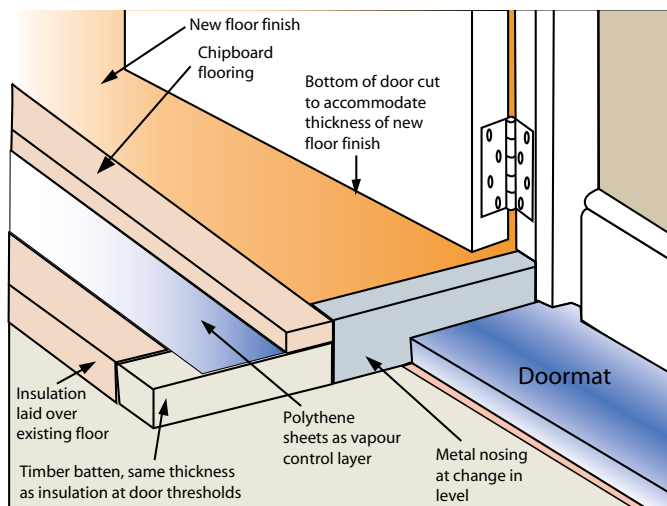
Incorporating a well in insulation above a concrete floor¹⁴
